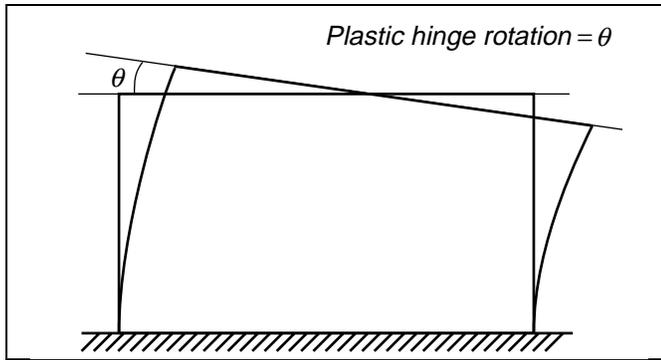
Plastic Hinge Rotation in Shear Wall where Flexure Dominates Inelastic Response
